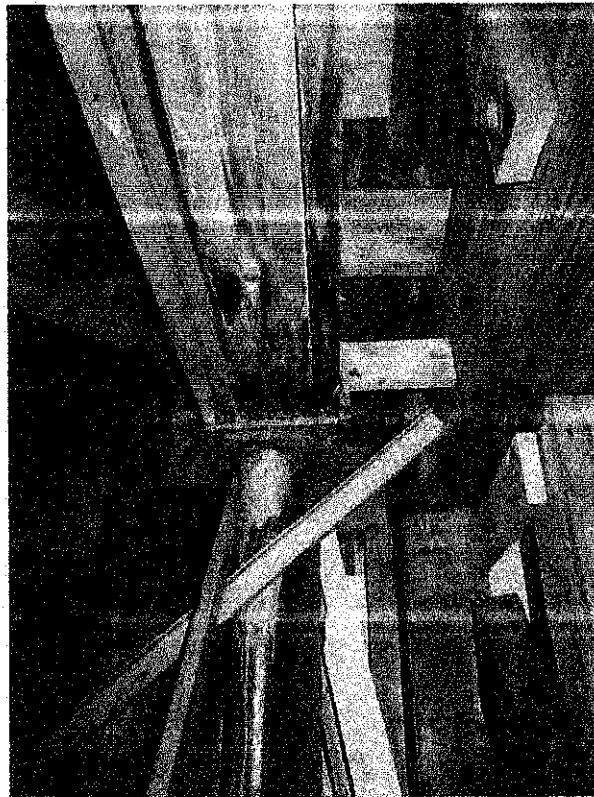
Reinforcing column, with deeply water-stained beams & rusty cap
